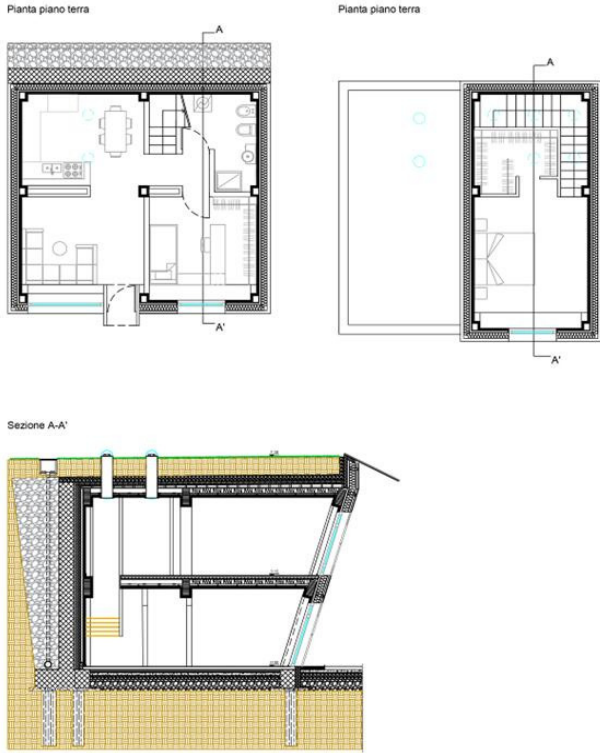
Plans and vertical cross section of the dwellings of 67 m².
